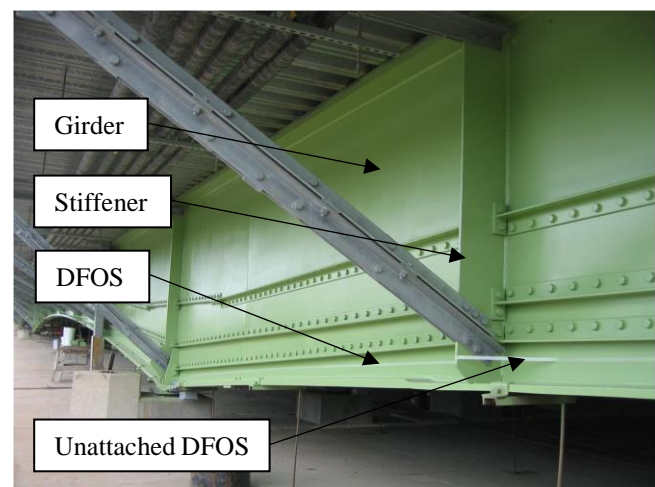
Steel girder with welded stiffener and DFOS in current monitoring system
